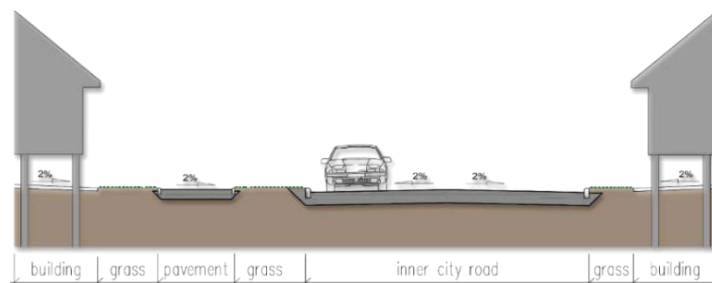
Type cross-section of urban road and structural landscape areas (Yamata, 2002-2007).
